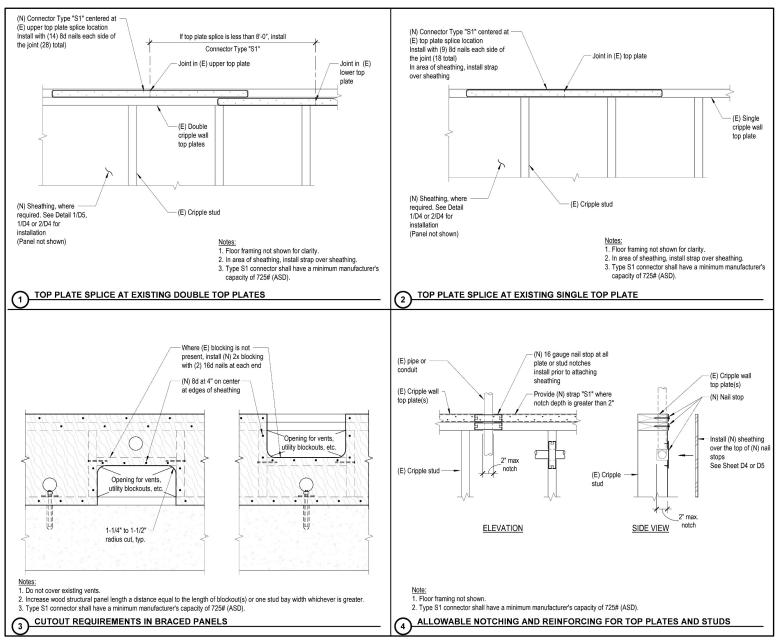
Vent openings and top plate details. Sheet D6.
